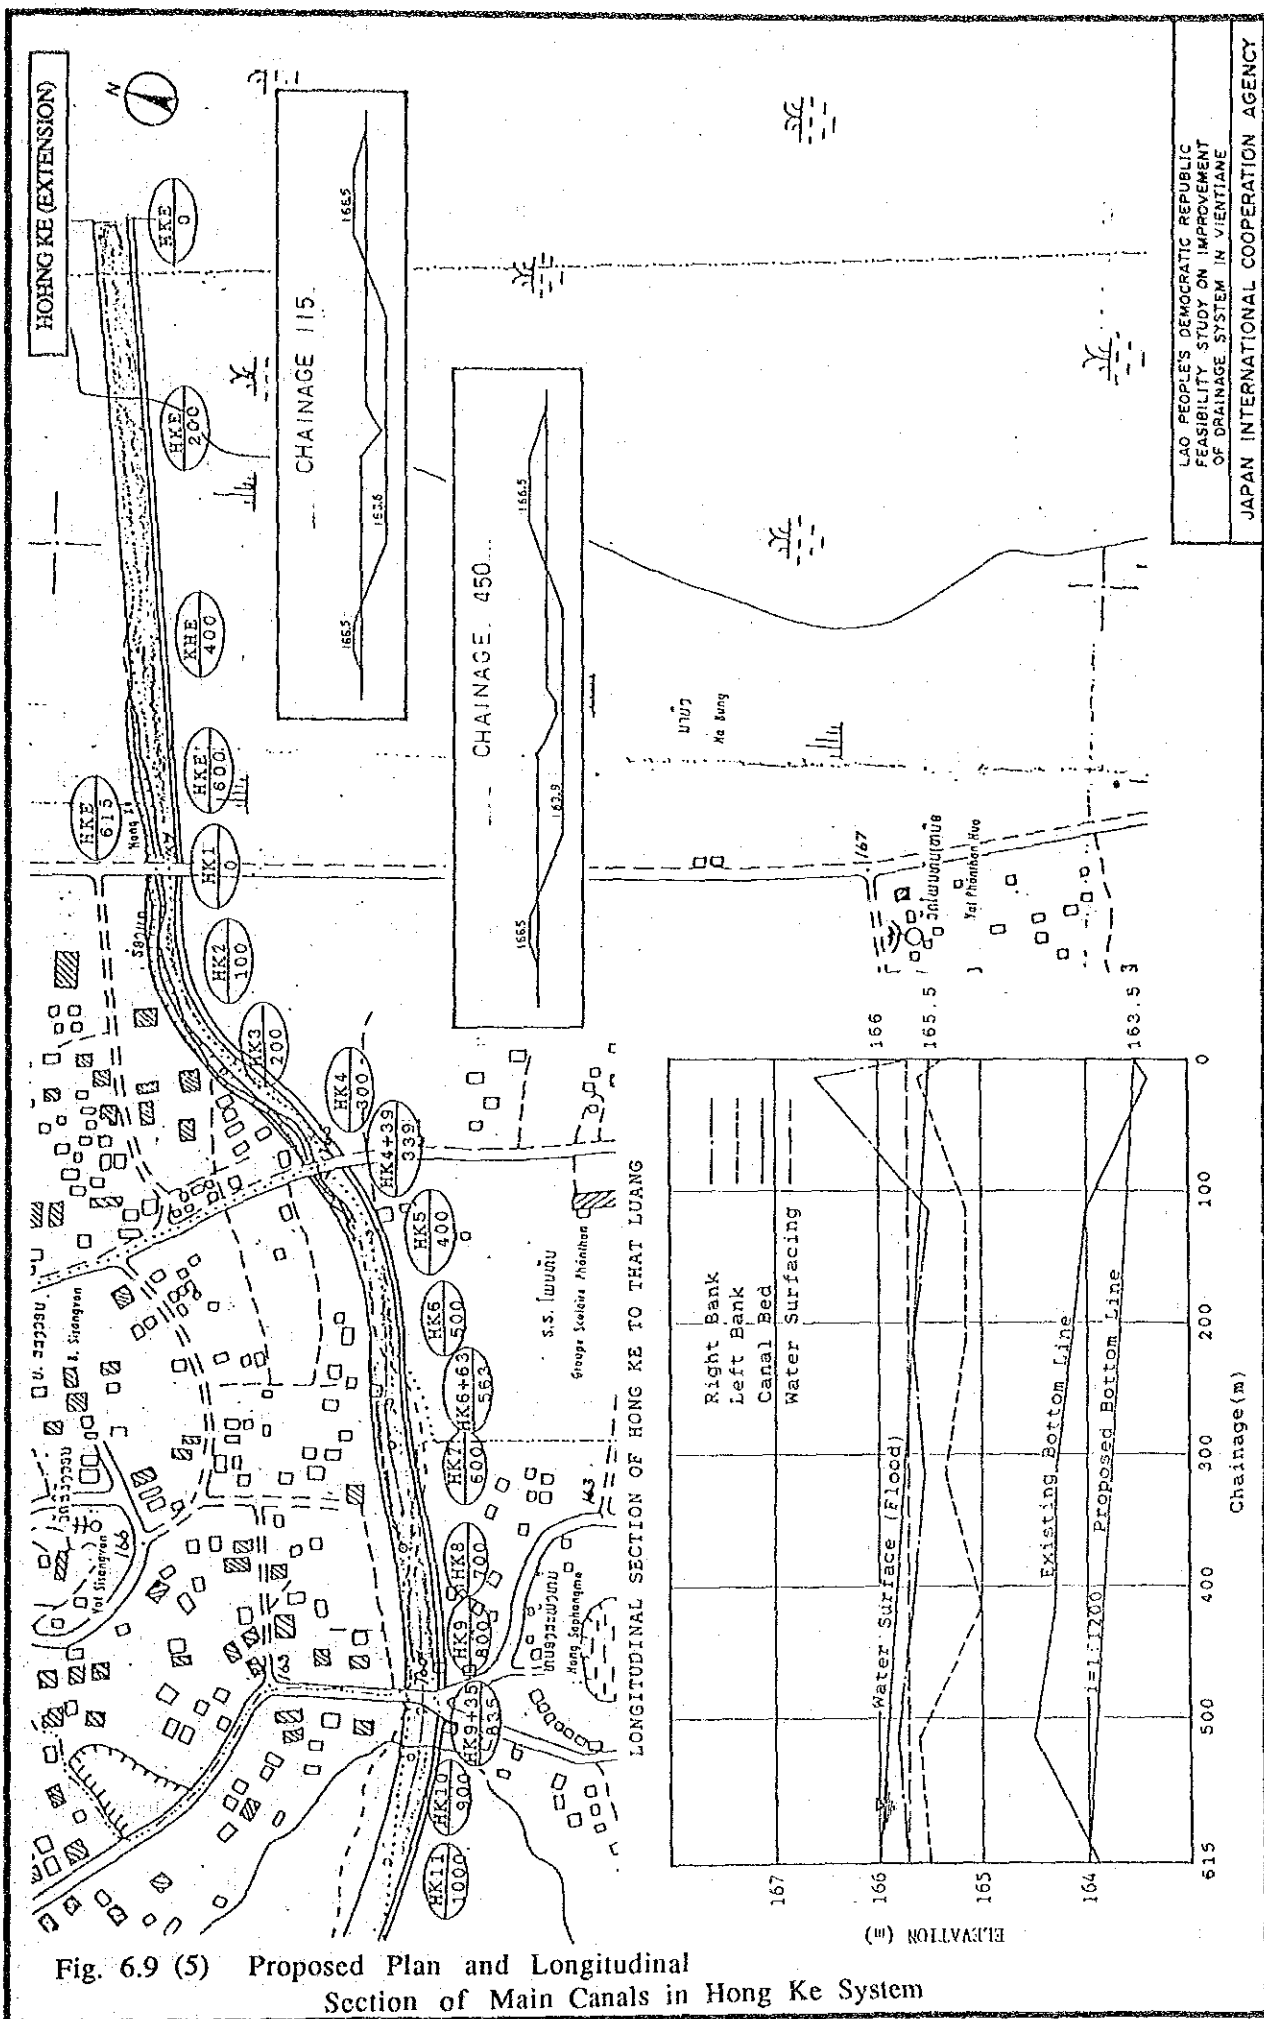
(4) Proposed Plan and Longitudinal Section of Main Canals in Hong Ke System
